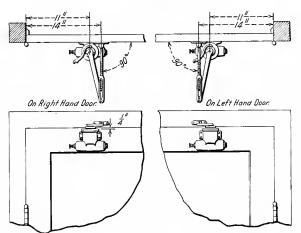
Application of Russwin Door Check. Russell & Erwin Manufacturing Company.
